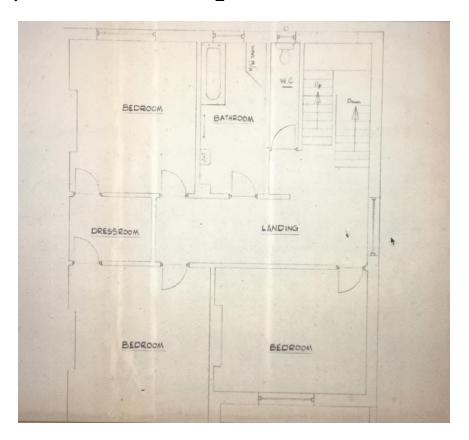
Shows original layout of first floor of 21 Downleaze. The proposed new entranceway is where the original entrance to the W.C was located. As can be seen from the plans there was no original partition located on the landing between the landing and communal staircase, and no partition within the landing itself.
